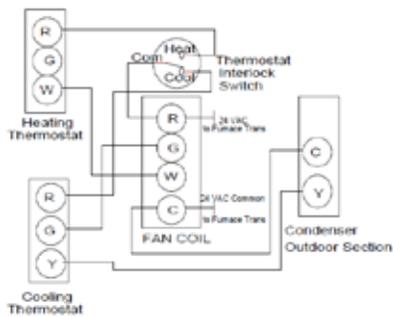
Heat/Cool Thermostat Connections - Separate Thermostats & Single Transformer in Air Handler
